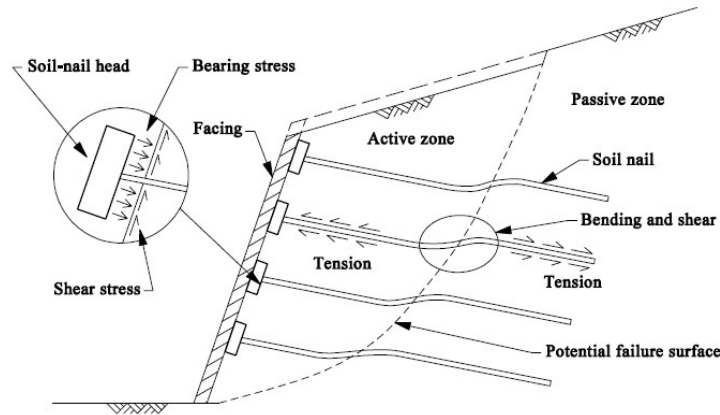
a) Typical Cross Section of a Soil Nail Wall; b) Detail of the Nail Head (after FHWA, 2003).
